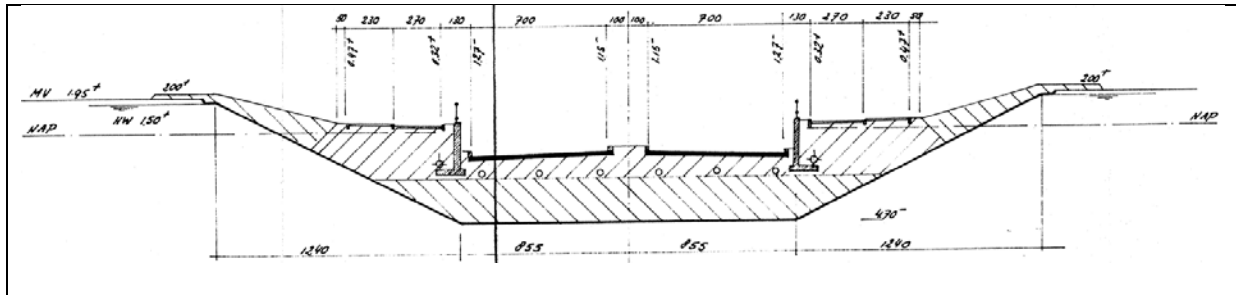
Cross-section access roads constructed with a geomembrane barrier system ballasted with backfill [Technical drawing, Dutch Railway Institute, 1968].
